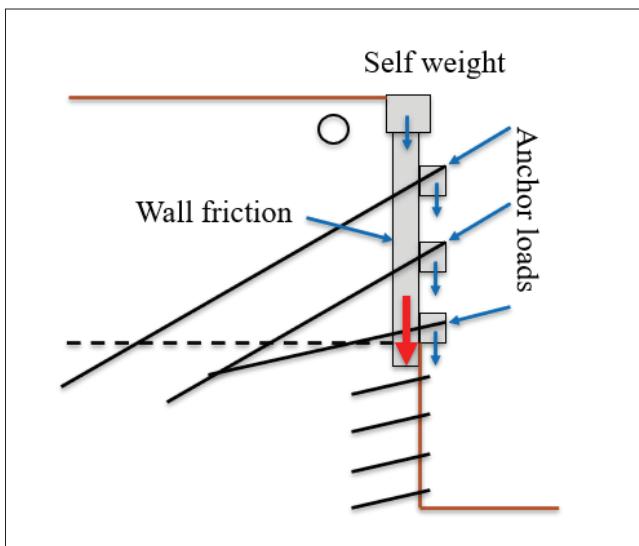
Typical cross-section of the retaining wall showing how vertical stresses develop at the pile toe
